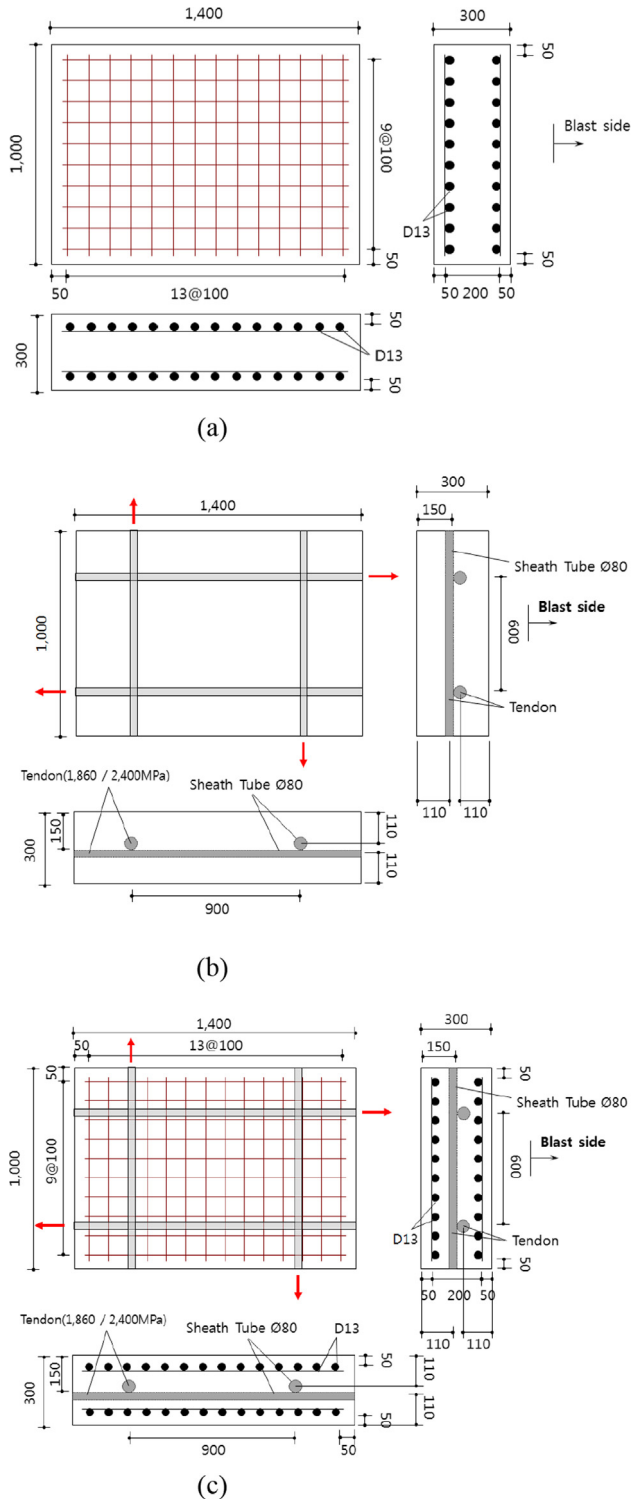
Specimen types and details (unit: mm): (a) RC specimen; (b) PSC specimen; (c) PSRC specimen.
